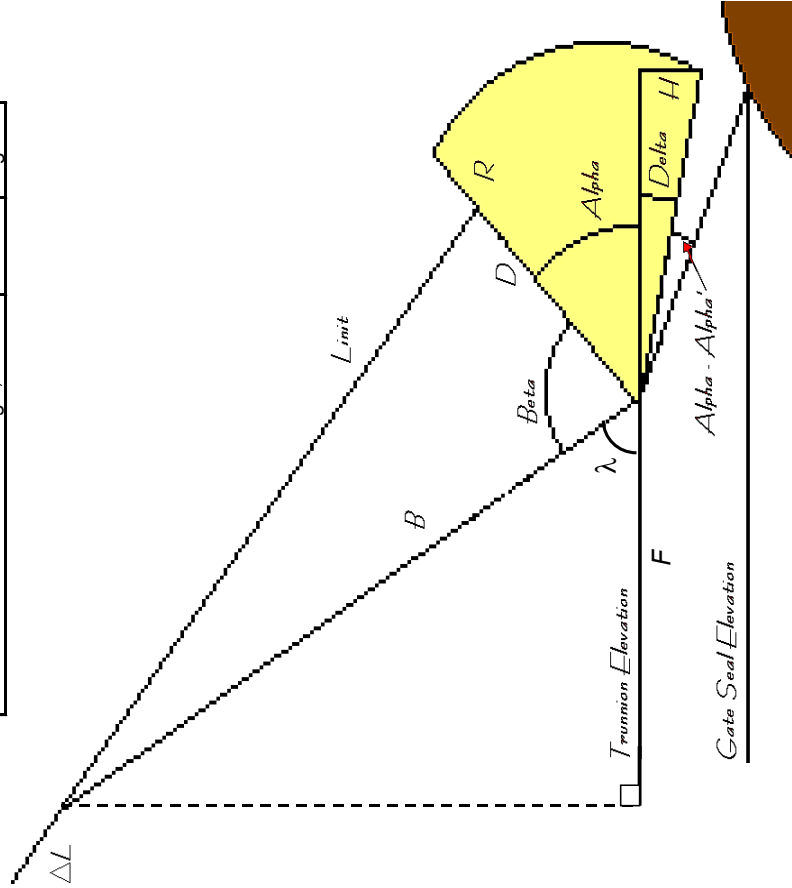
Details of 1:48 Model Sluiceway—Gate 1
